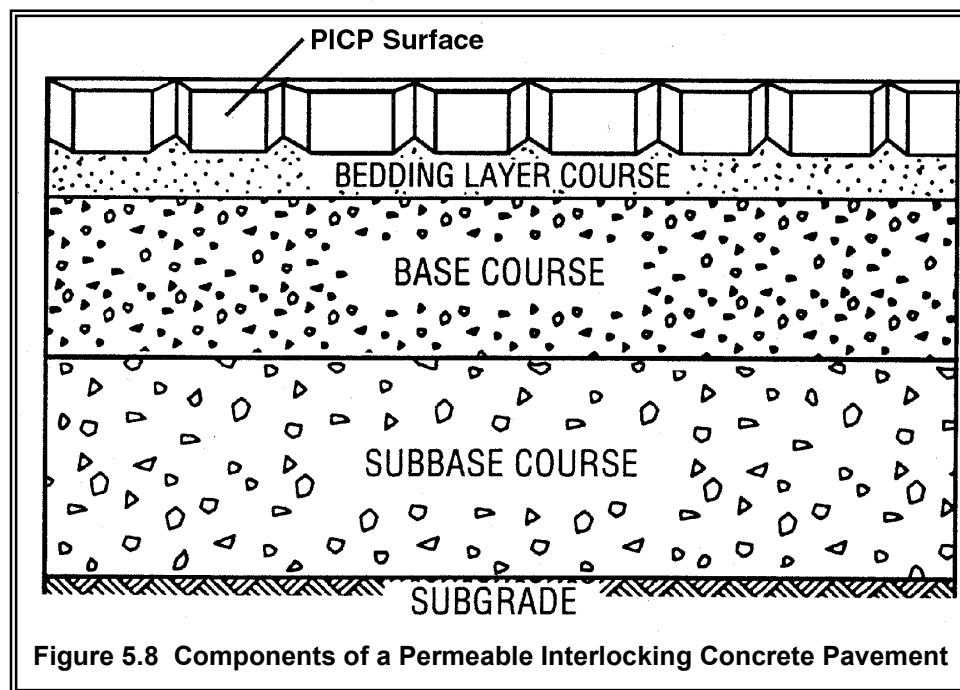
Components of a Permeable Interlocking Concrete Pavement
